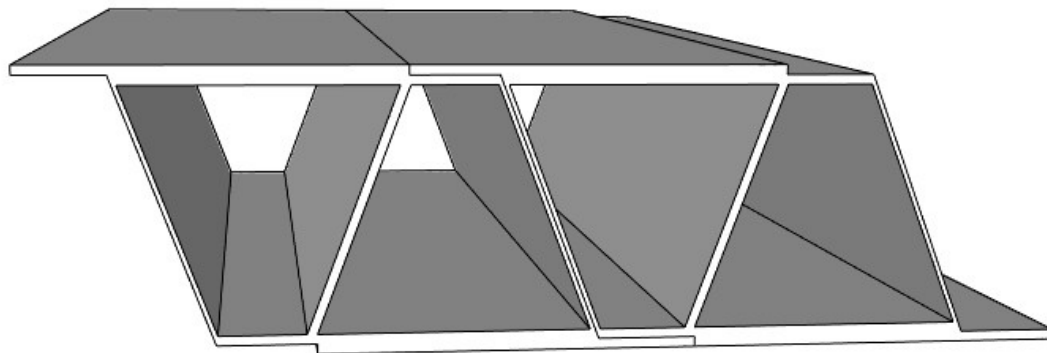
ASSET bridge deck profiles connected by adhesive bond.
